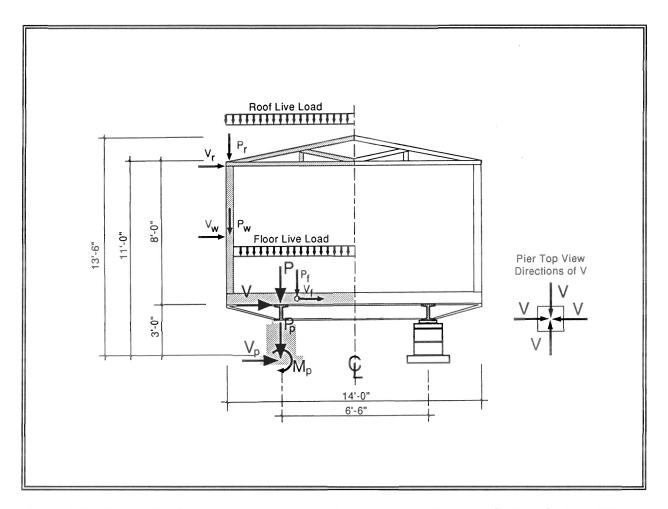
Load Configuration on a Typical Single-wide Section of Manufactured Home
